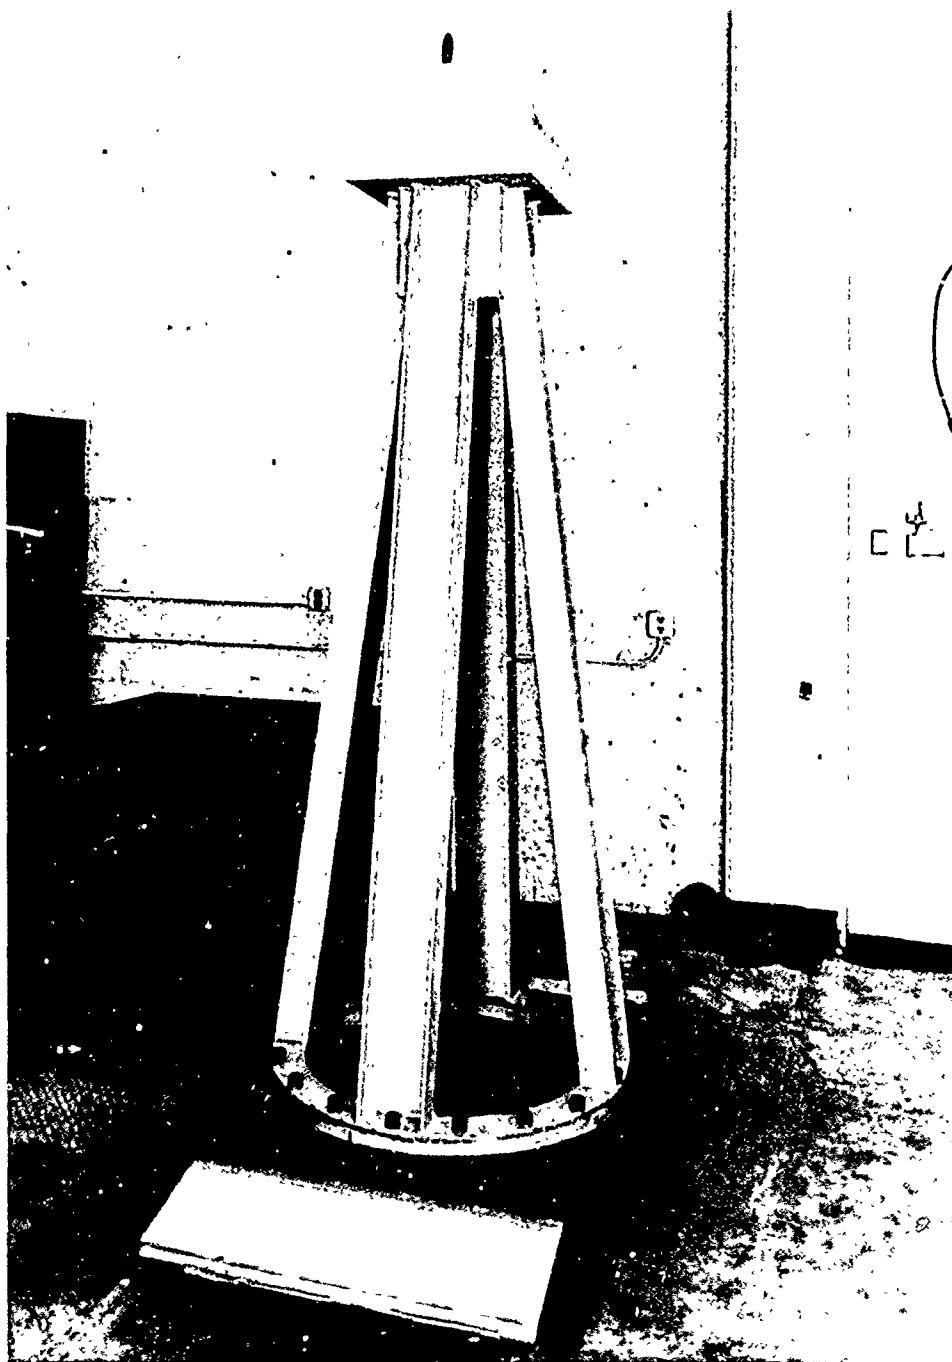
Test Structure No. 2 after removal of the damming strips. Overall height is $90 \frac{3}{4}$ in.
